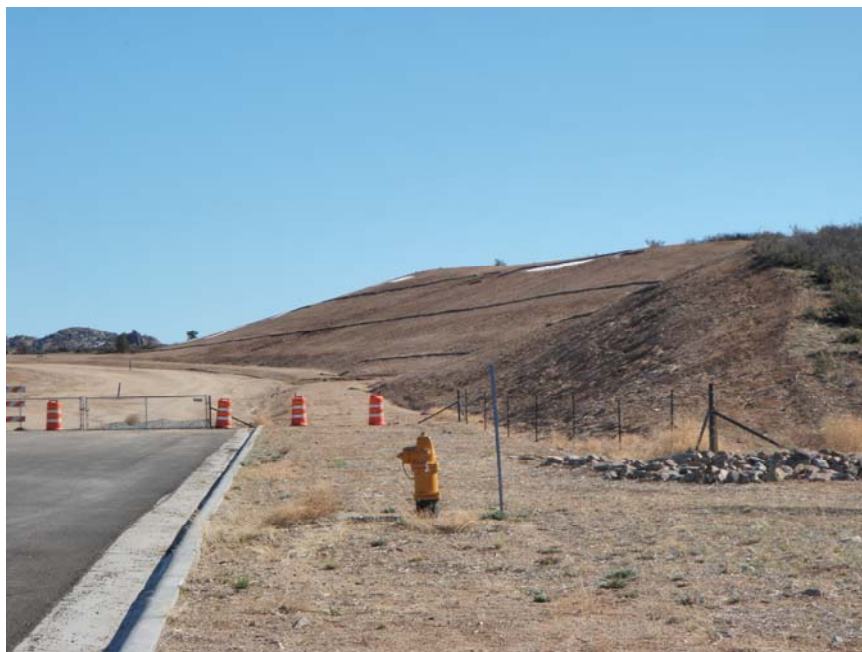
Falcon Point Subdivisions – Site ground cover and stabilizing slope cover.
